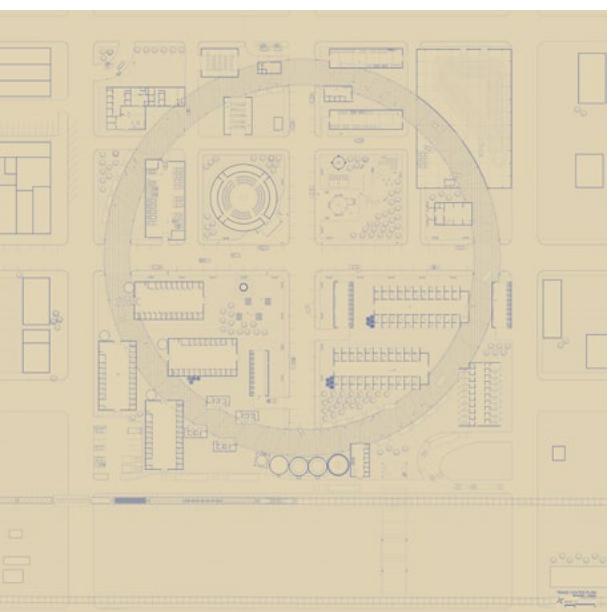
A -ville with its own bank. New town plan. Fall 2018 TTU COA.
